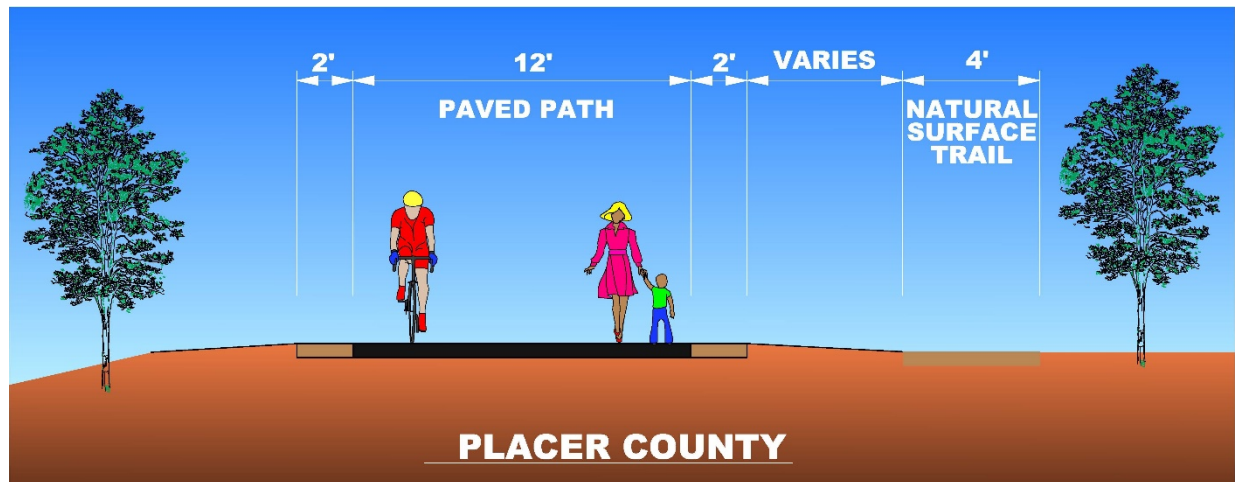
Proposed Multi-use Trail Typical Section within Placer County
